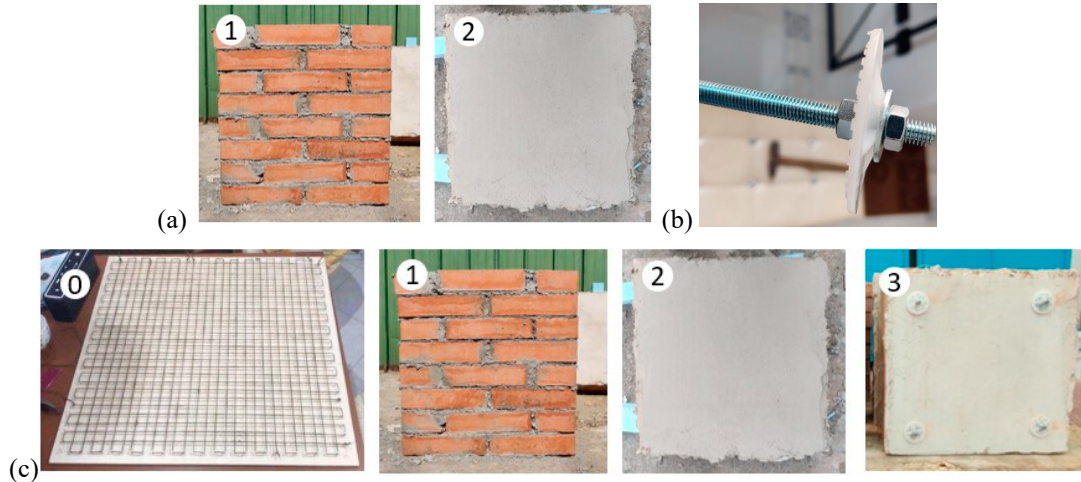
Manufacturing of unreinforced wall (a), mechanical anchors used for the reinforced wall (b) and manufacturing of reinforced wall samples (c).
